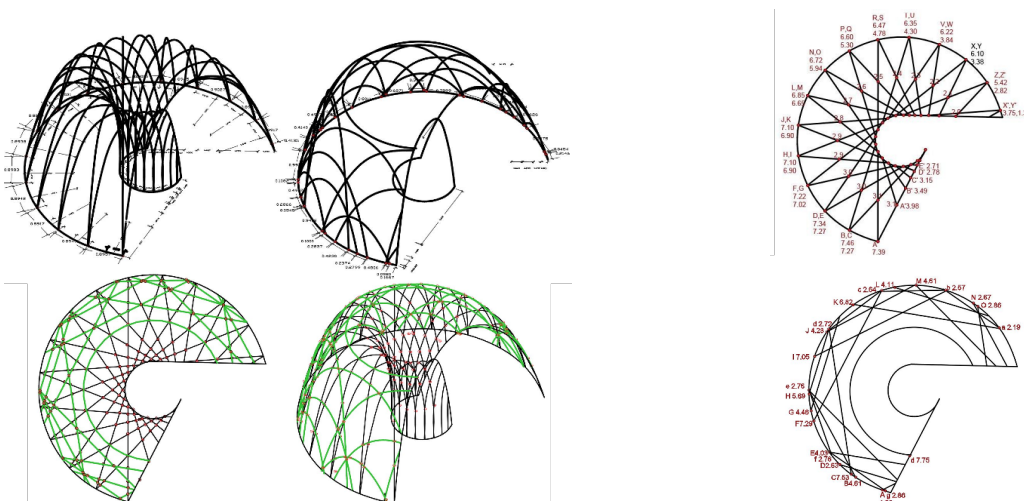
Construction, joinery counts, junction positions, support point distribution, and bamboo strip lengths are all shown in the structural development design for the bamboo framework
